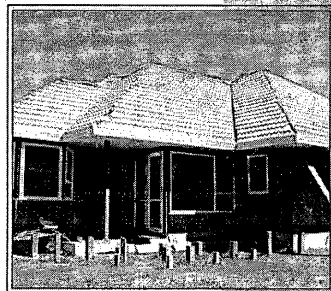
Rigid sheet wind barrier of bitumen-coated insulating board.
